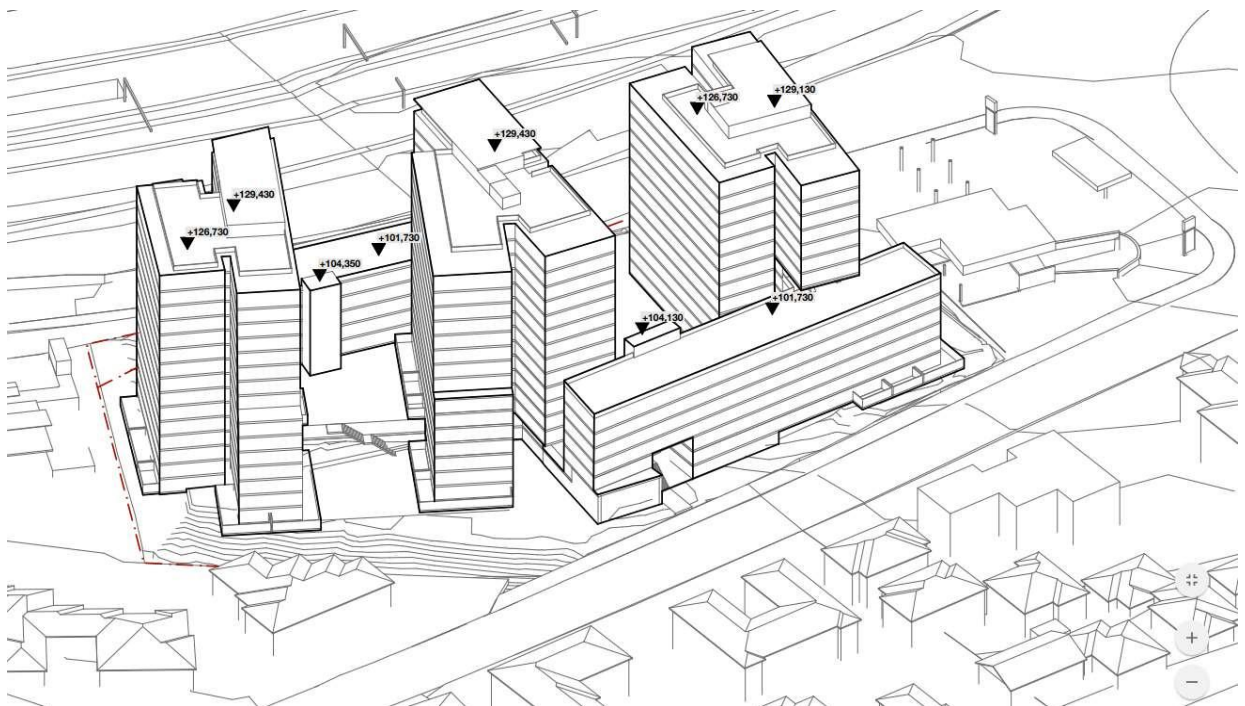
Proposed building envelope (Source: Bennett and Trimble)
